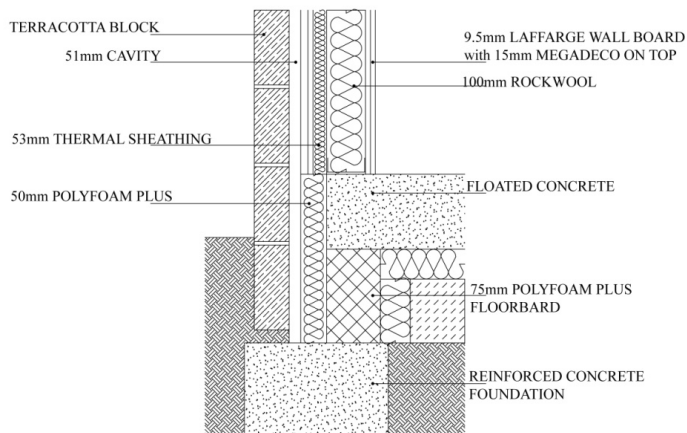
Concrete slab on ground detail (SS025a-EN-EU, AccessSteel 2006)
